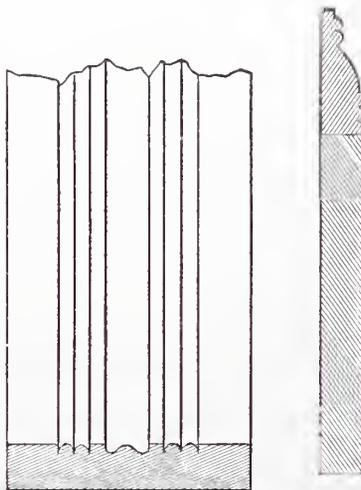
and 17.—Detail of Architrave and Baseboard.—Scale, 3 Inches to the Foot.
